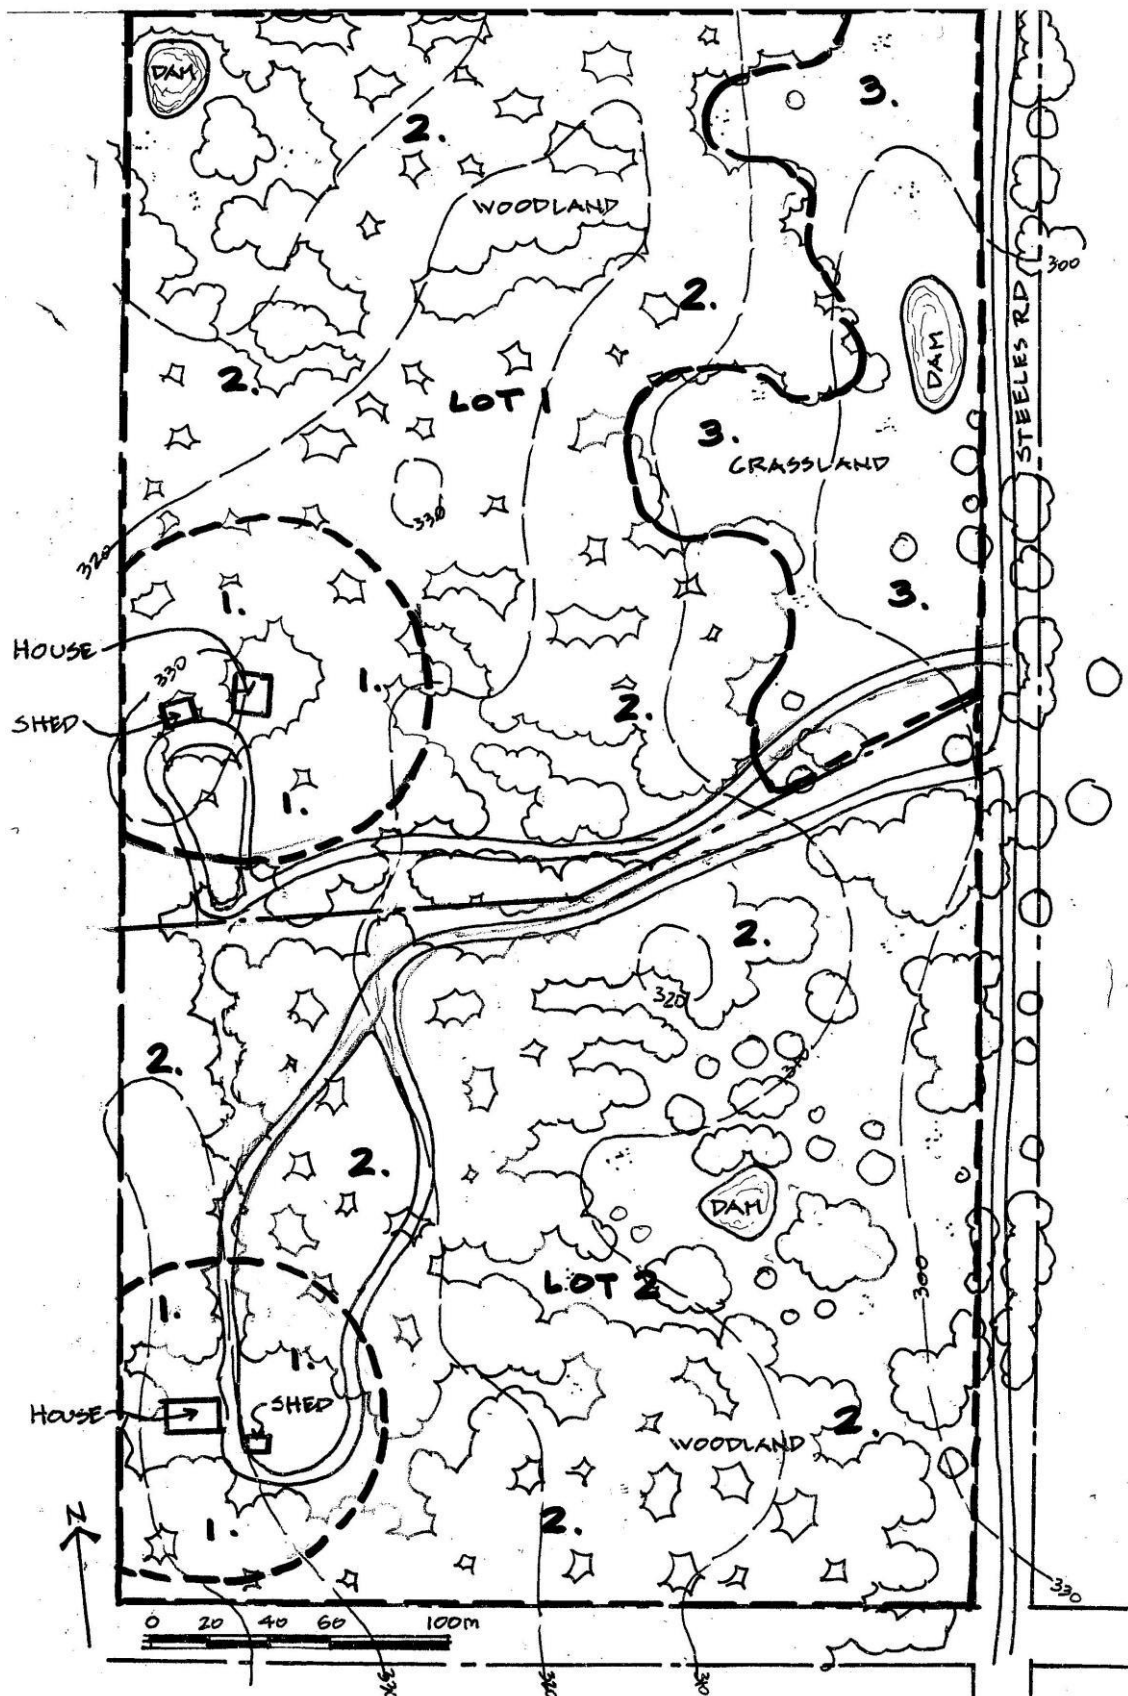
PROPOSED PLAN OF SUBDIVISION
